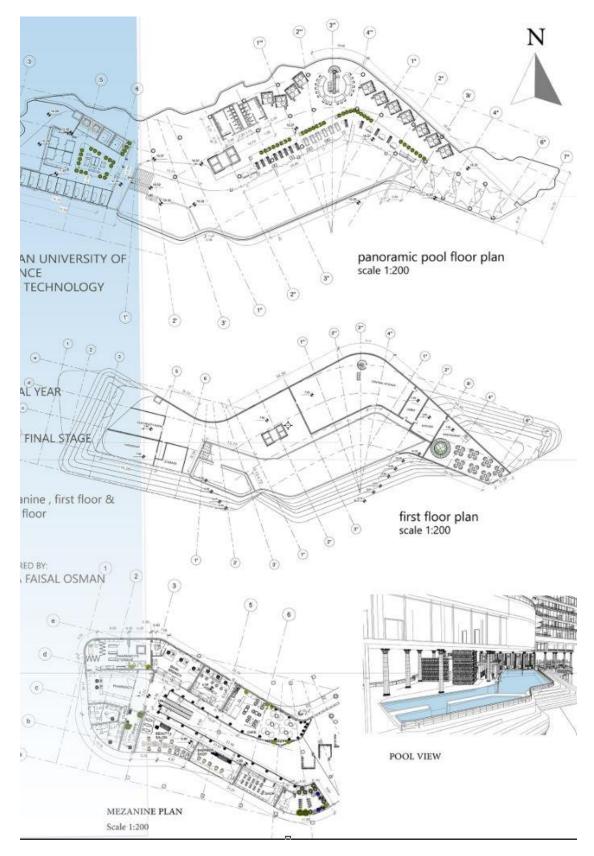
SHOWS MEZZANINE FLOOR ,FIRST FLOOR AND PANORAMIC POOL FLOOR .
